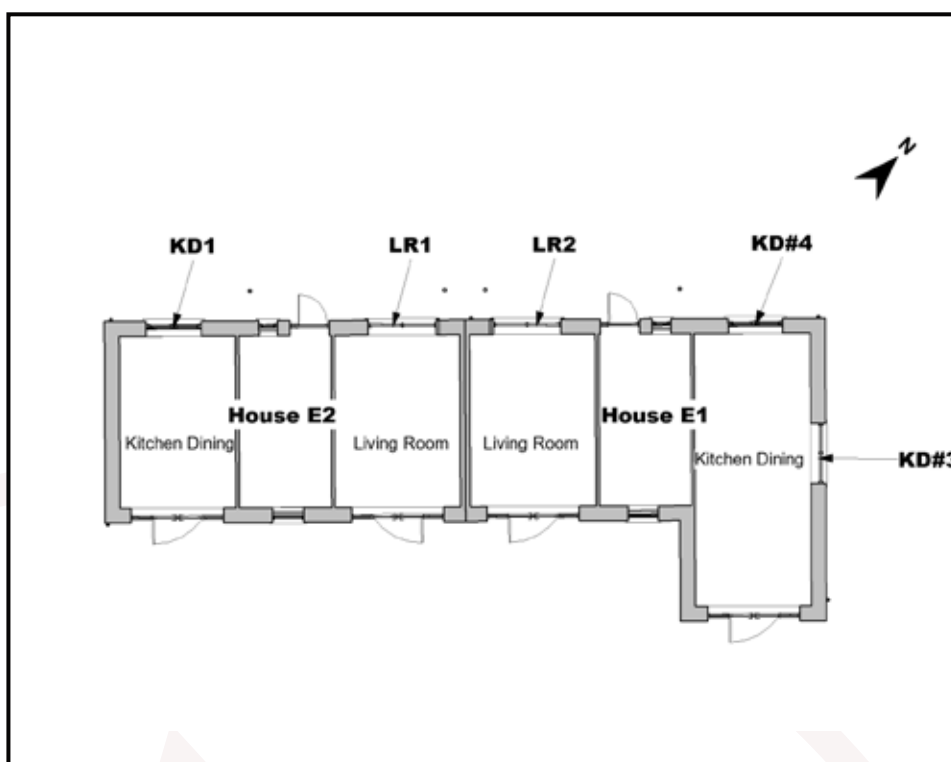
Floorplans with indication of the assessed windows/rooms Figure A.26: Floorplans with indication of the assessed windows/rooms
